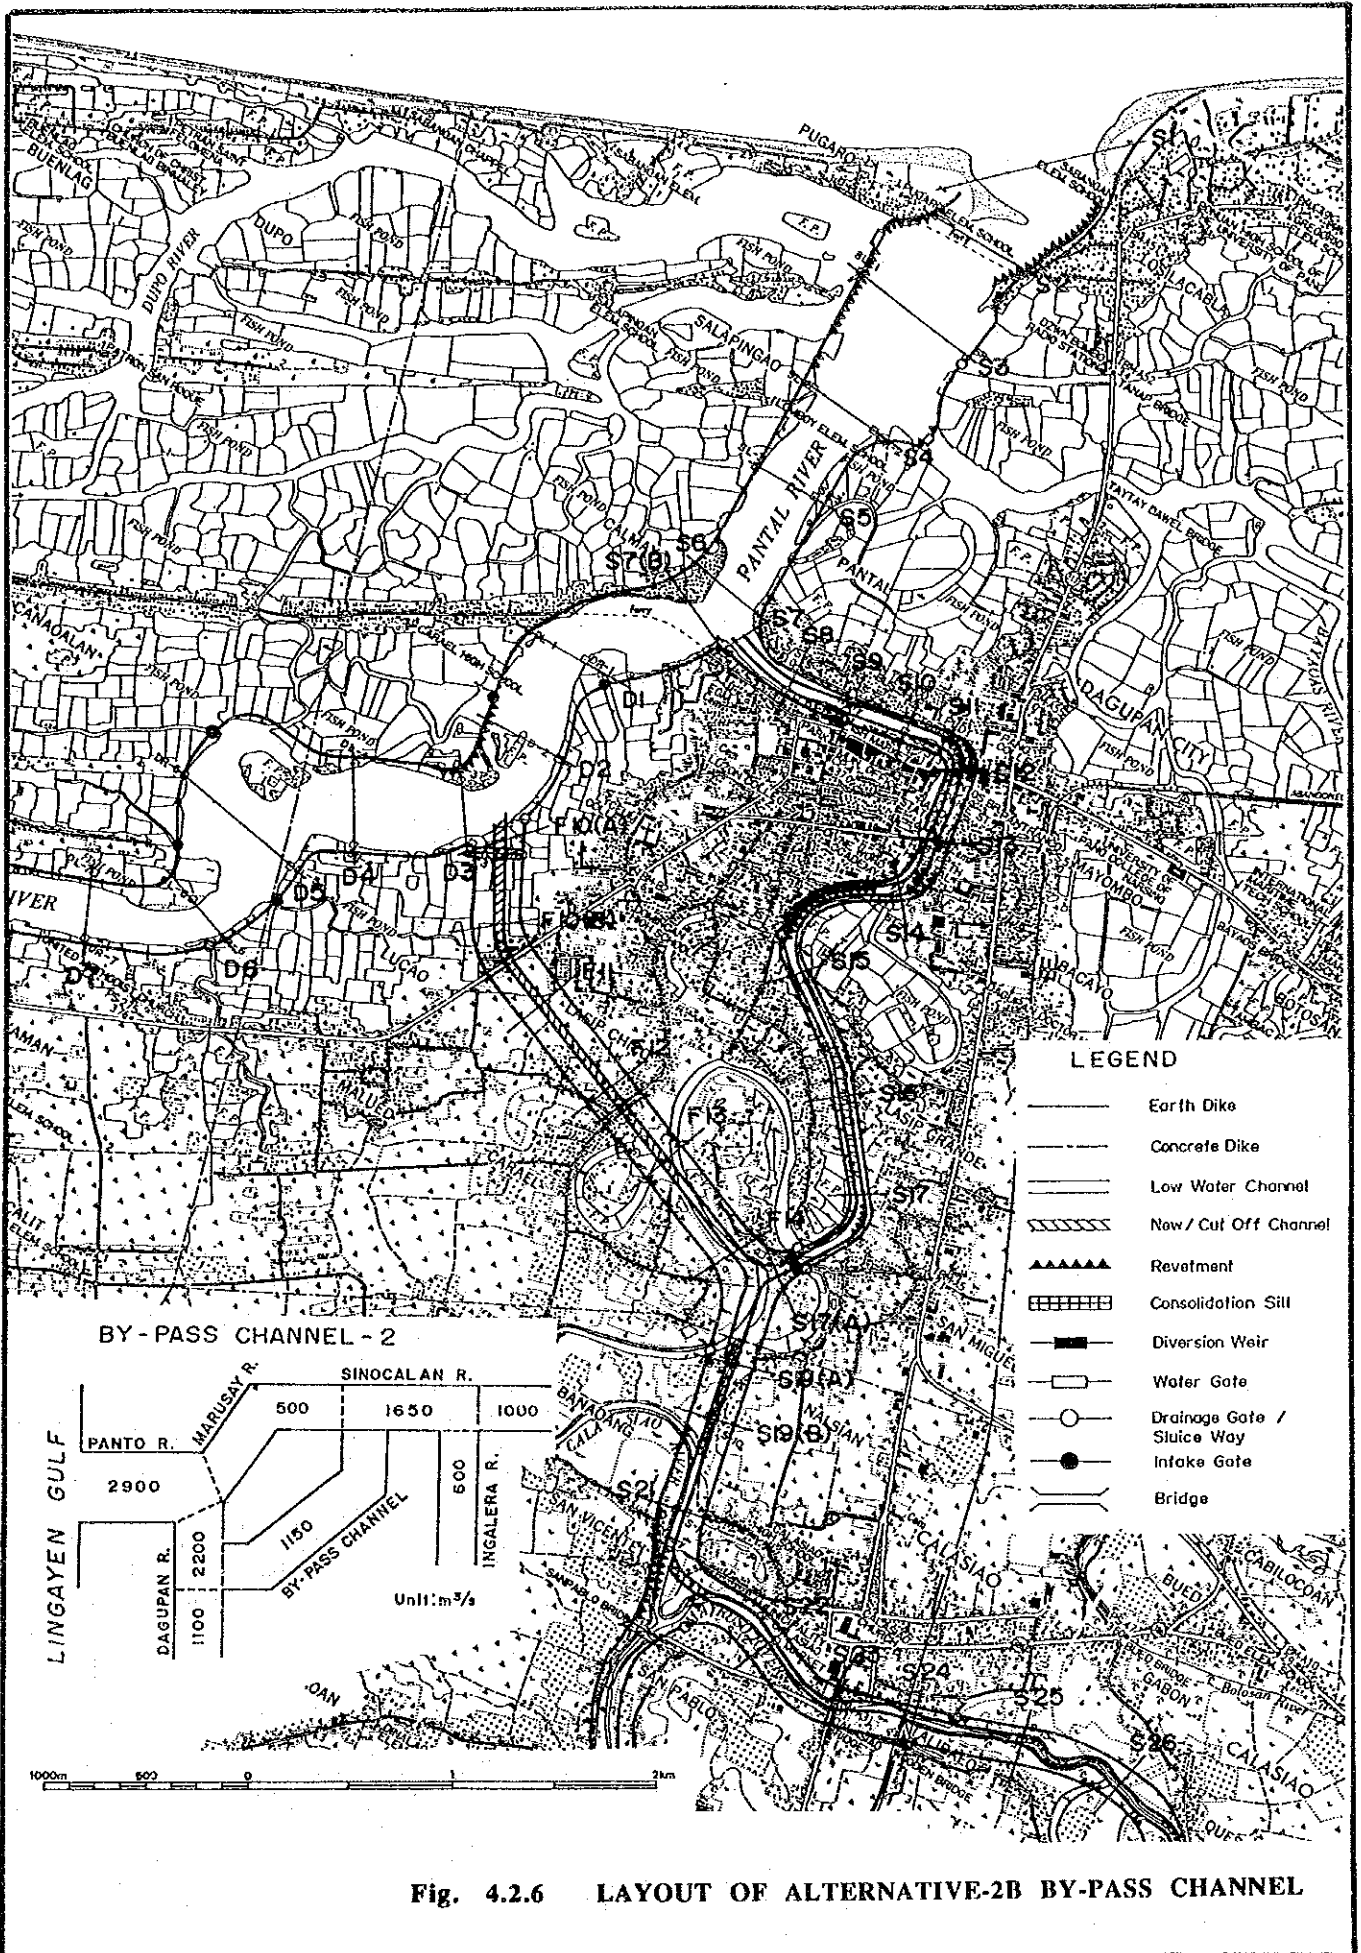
LAYOUT OF ALTERNATIVE-2B BY-PASS CHANNEL
